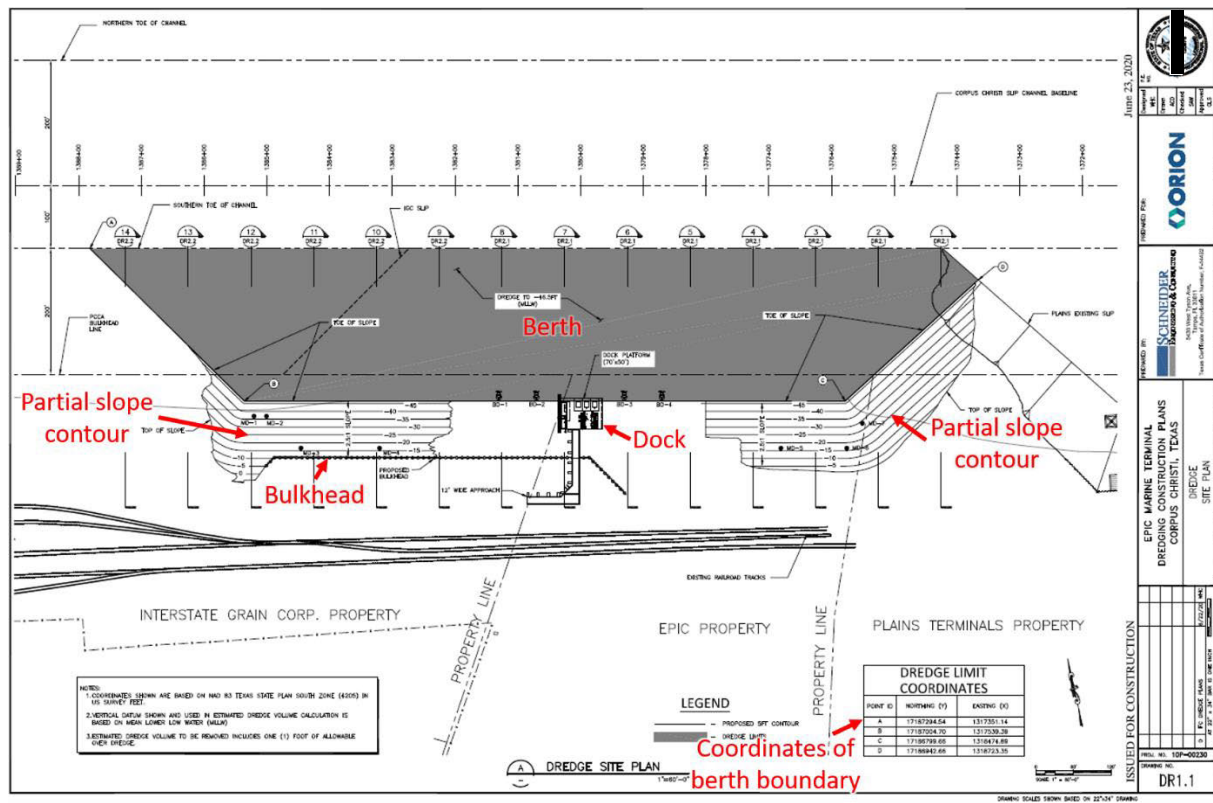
Dredge Site Plan from EPIC East Dock dredging plans, with annotations in red by NTSB. (Source: Orion Marine Group)
